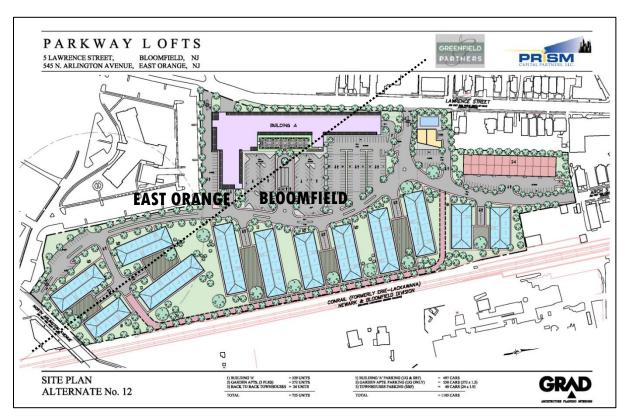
The project for 5 Lawrence Street will provide for the existing former industrial building (Building A) to be rehabilitated into 329 residential units, the construction of 372 garden apartment units in 12 buildings, ten of which would be in Bloomfield, and 24 back-to-back townhouses, also in Bloomfield. The entire site is within a ¼ mile walking distance from Watsessing Center and Watsessing Station.
